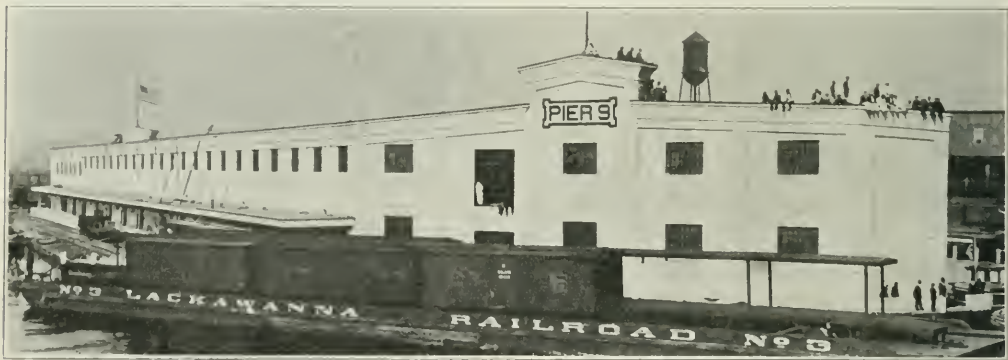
Example of Concrete Construction as Applied to Pier Sheds
